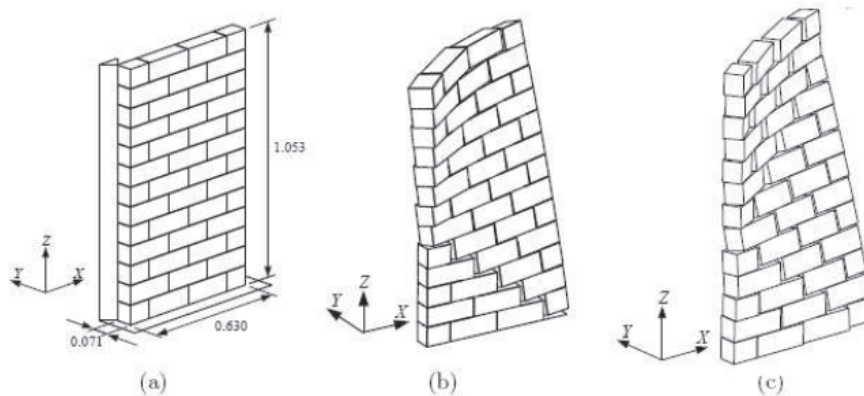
Out of plane loaded wall, supported at one edge; (a) model; (b) FEM failure mechanism ($\alpha = 0.210$); (c) limit analysis failure mechanism ($\alpha = 0.216$) (Orduña and Lourenço, 2005b).
